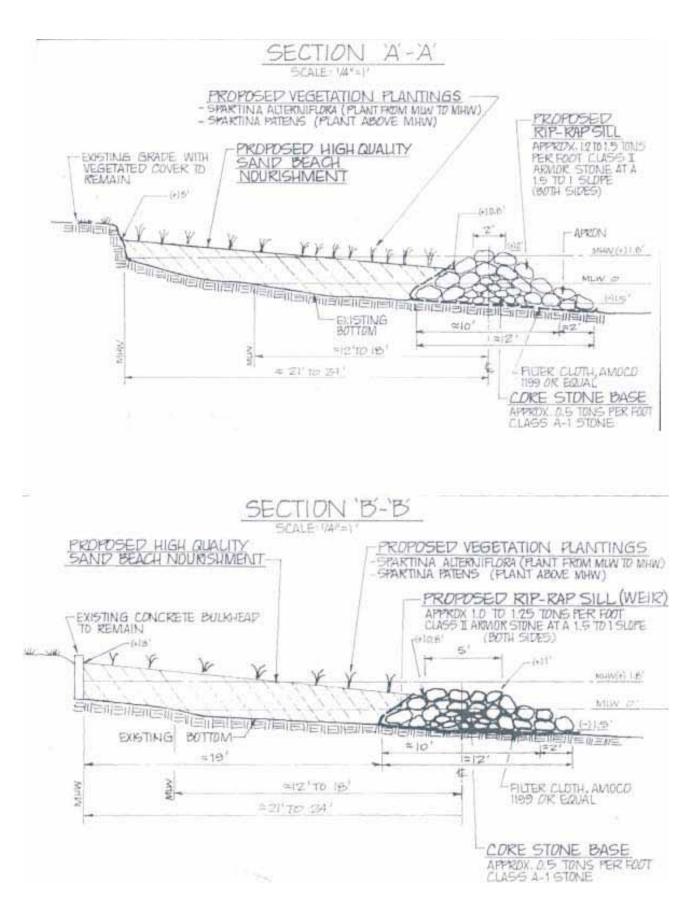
Typical cross-sections for sill built at Hull Springs Farm. Section locations are shown on Figure 4-8B. Permit drawings by Bayshore Design, LLC.
